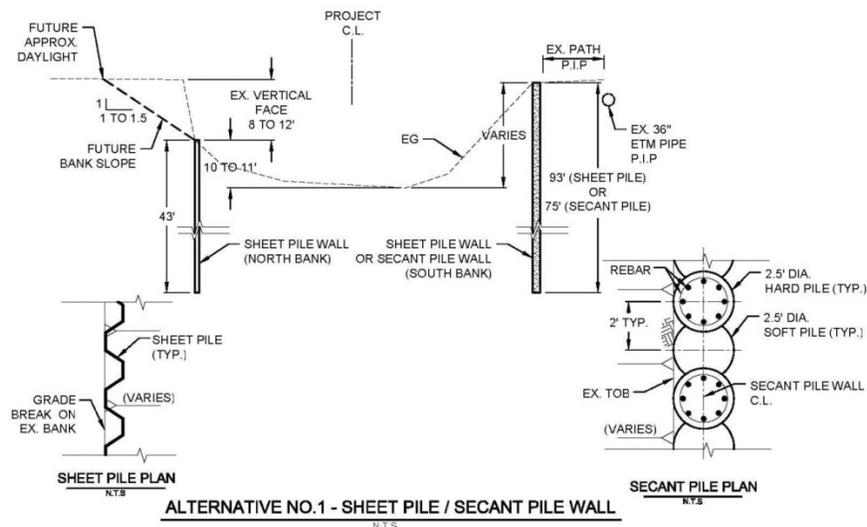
Typical Section of Sheet Pile Wall (Alternative 1)
